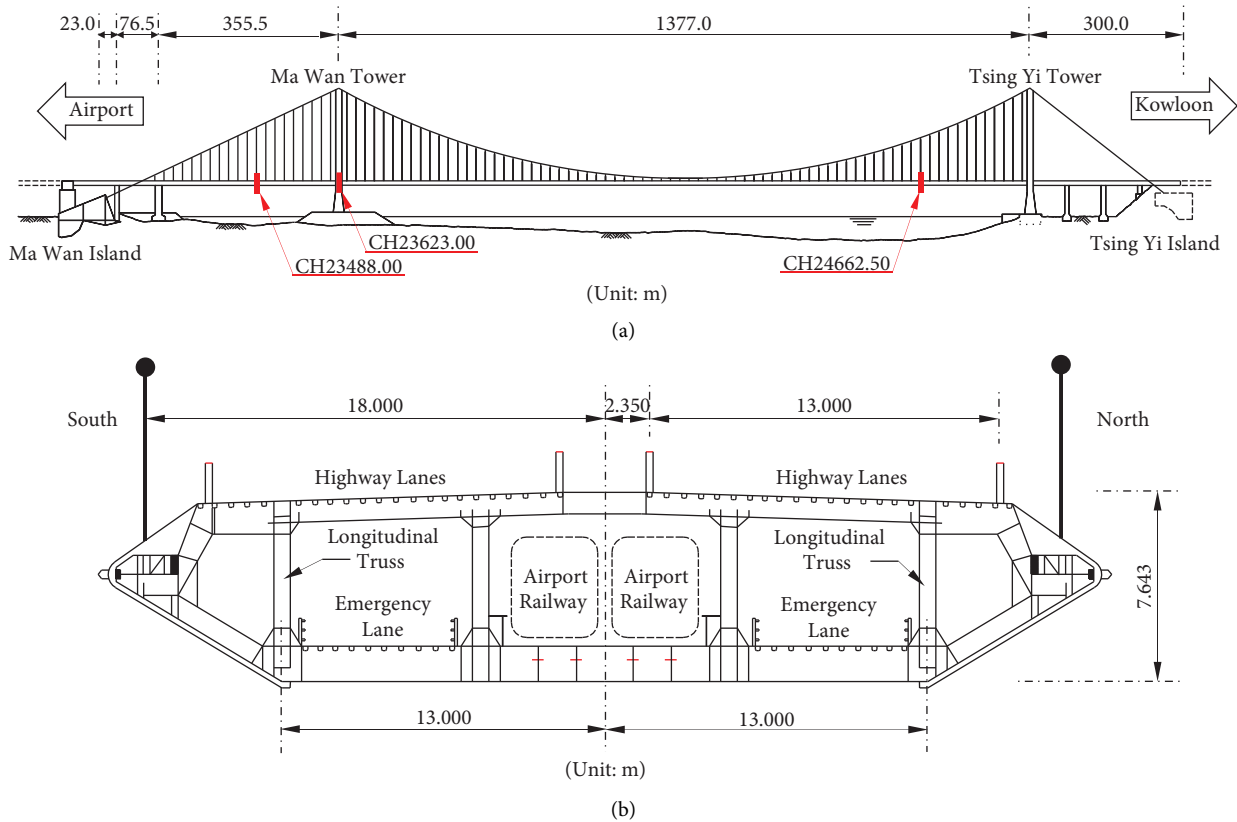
Layout of TMB and strain monitoring sections. (a) Deck sections instrumented with strain sensors. (b) Deck cross-section.
